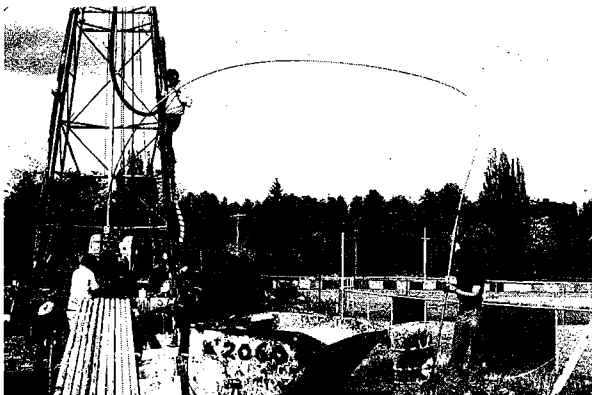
Installation of 3/4-inch PVC pipe in boring with multiple piezometers.
